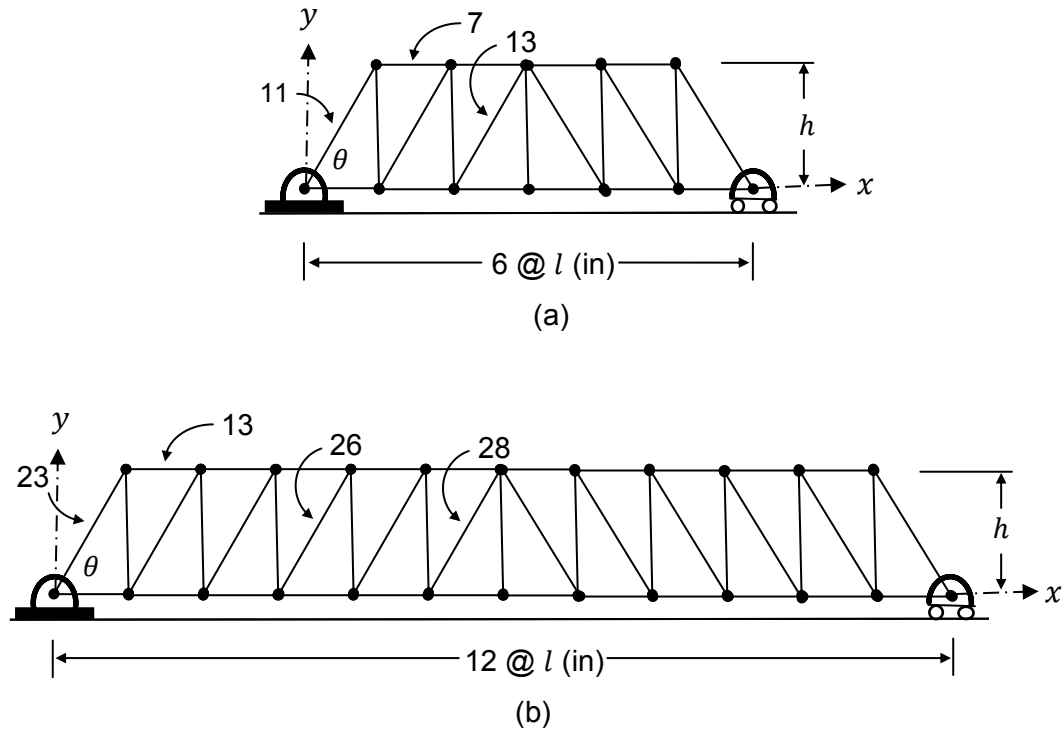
(a) Howe Truss – 21 Members with Three Damaged Members. (b) Howe Truss – 45 Members with Four Damaged Members.
